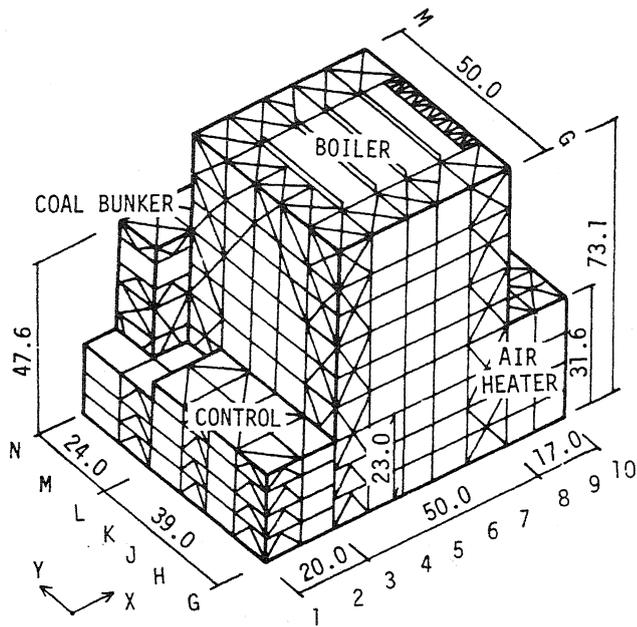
STRUCTURAL FRAMING (UNIT:METER)
